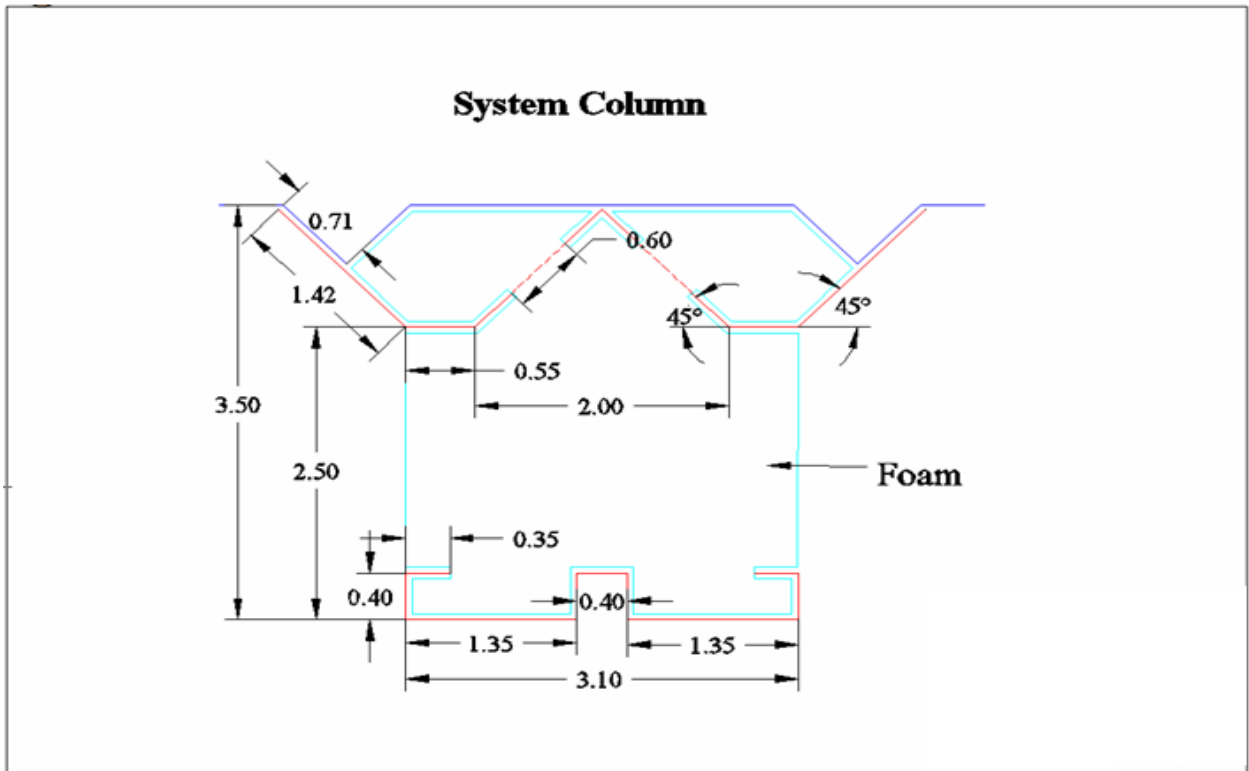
Cross-section of the original column with foam (unit: inches)
